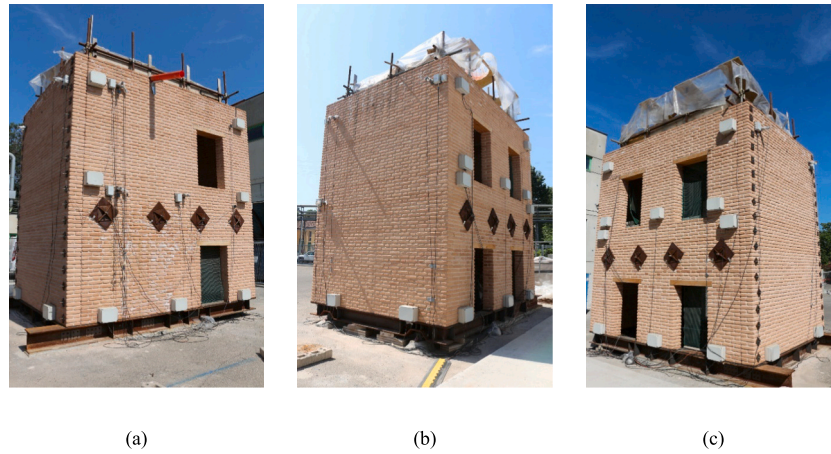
Masonry building mock-up: a) north-east façade, b) south-west façade, and c) south-east façade.
